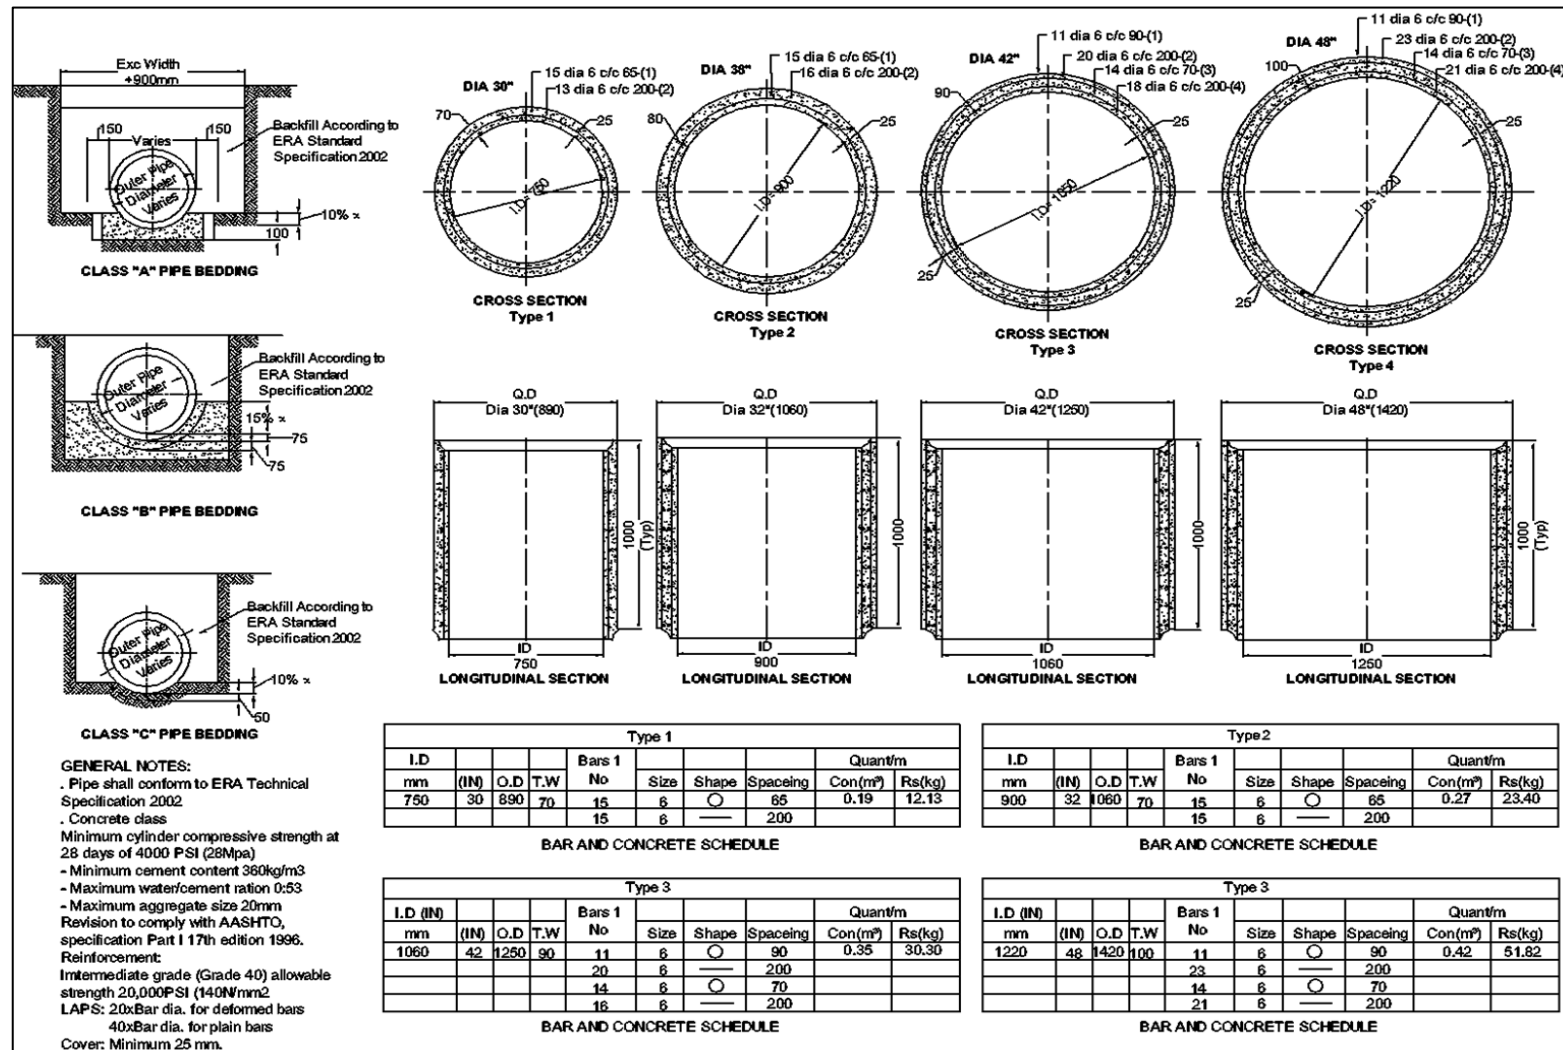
Reinforced concrete pipe as per ERA-2002
